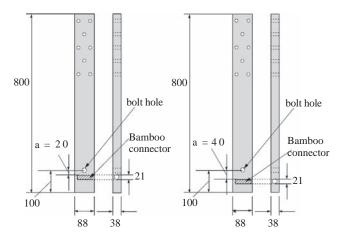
Shape and size of specimen (GIR system: unit in mm).
